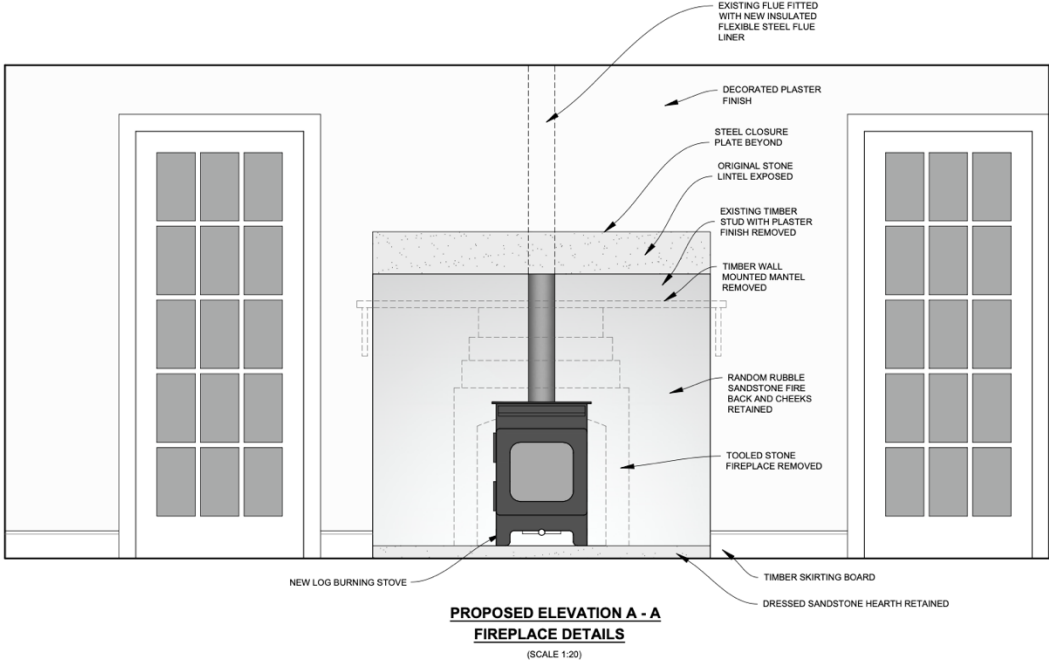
Plans showing proposed re-opened inglenook with central stone detail removed and installed log burner
